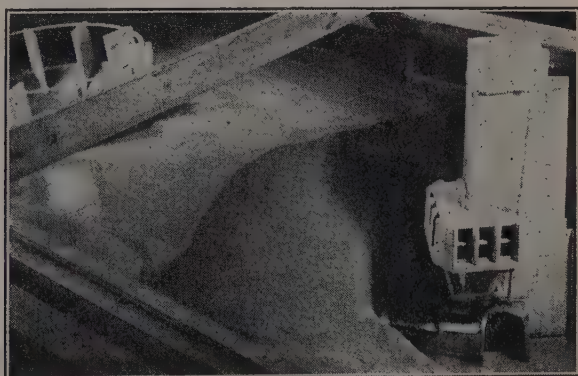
MODEL OF INTAKE TOWER, PLEASANT HILL DAM
